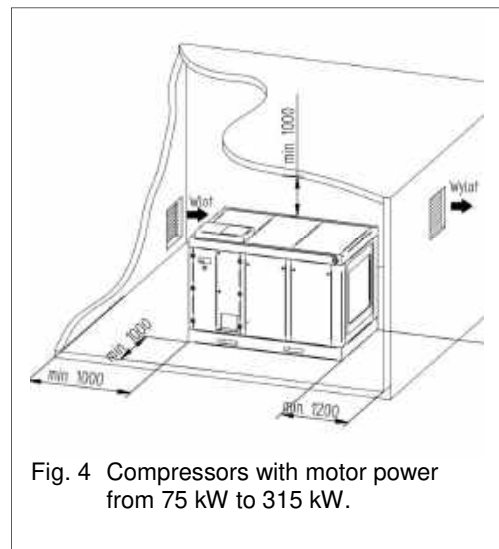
Compressors with motor power from 75 kW to 315 kW.
